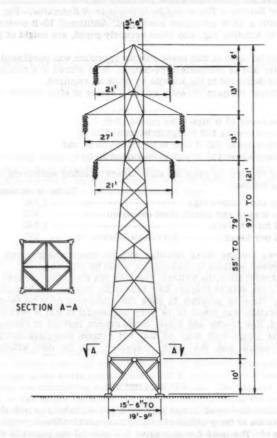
LINE TOWER WITH 10 FT EXTENSION
